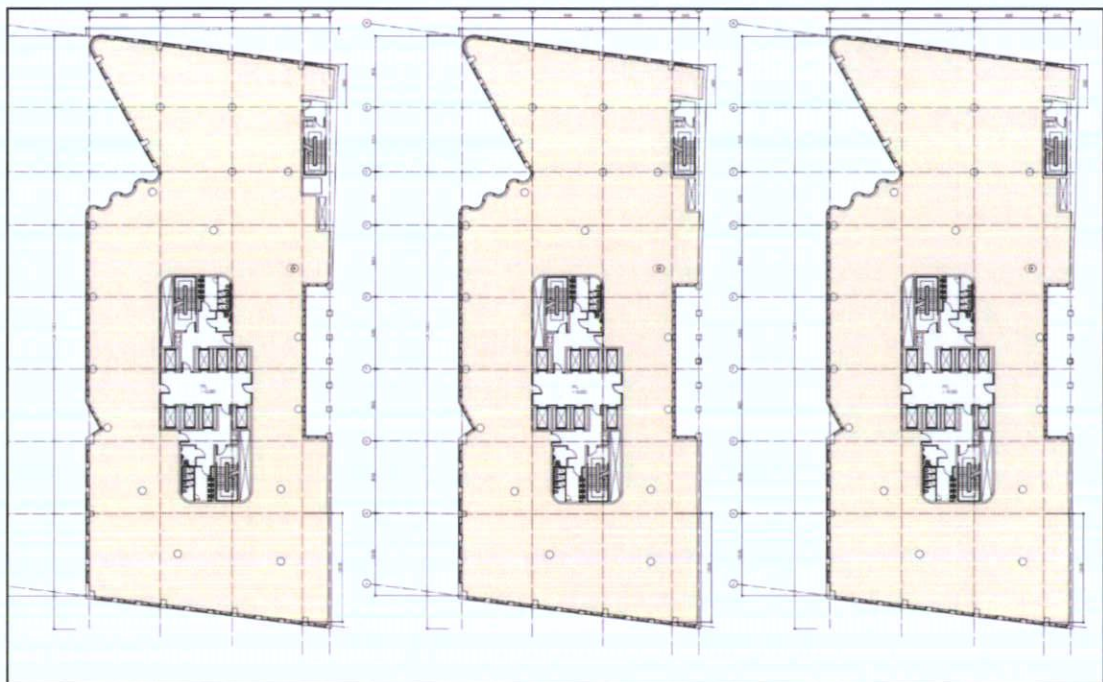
Proposed 2nd, 3rd and 4th Floor Levels (Mahoney Architecture 2022)
